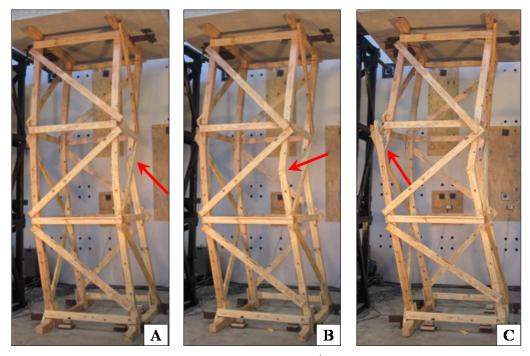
Specimen 6 Failure Sequence A) 1st Failure B) Front Right Failure C) Front Left Failure
